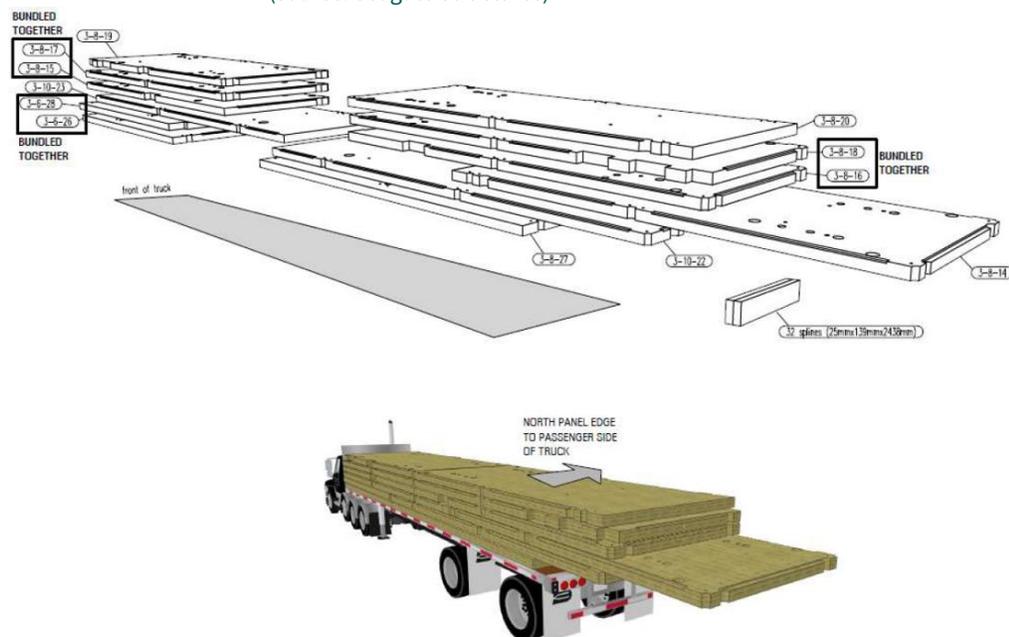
Detailed modelling of loading and unloading cycles (source: Seagate Structures)
